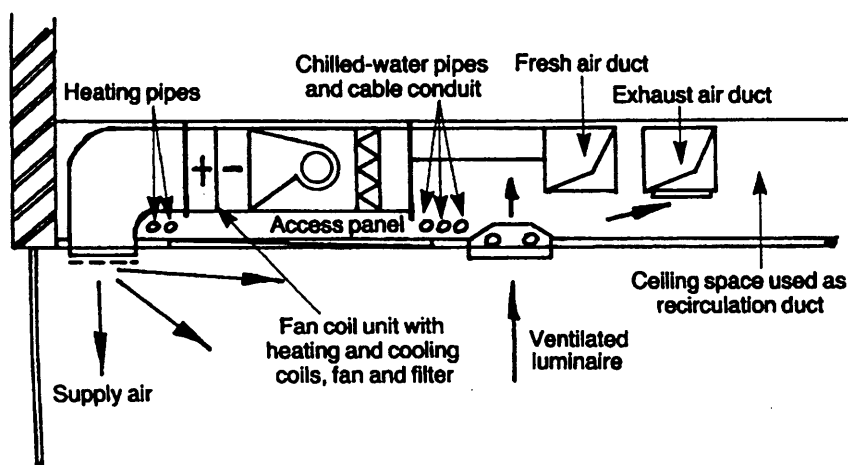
Example 4-pipe fancoil system (ceiling mounted)²⁷
